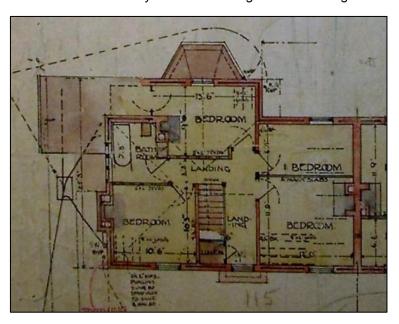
1909 first floor design plan of 115 Willifield Way (Hampstead Garden Suburb Trust)
